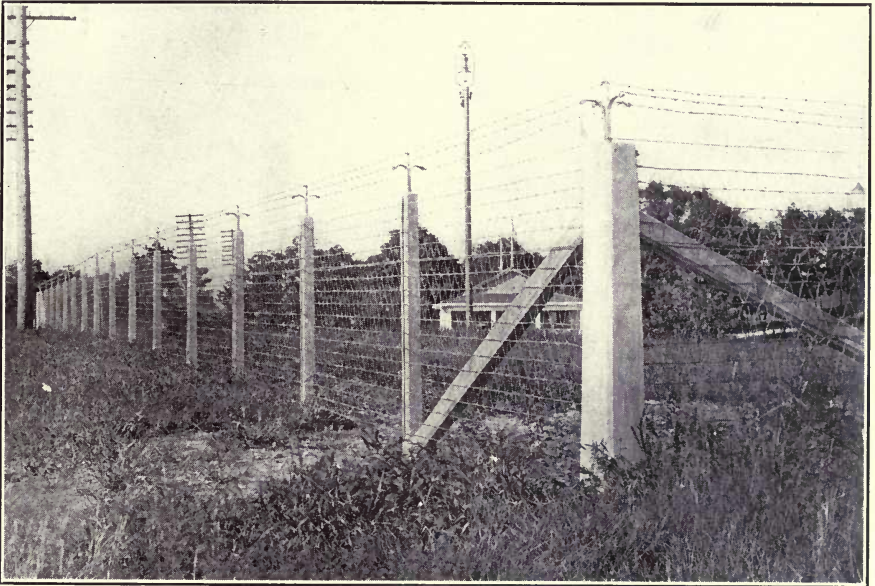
CONCRETE POSTS AT DELLWOOD PARK, JOLIET, ILL.
